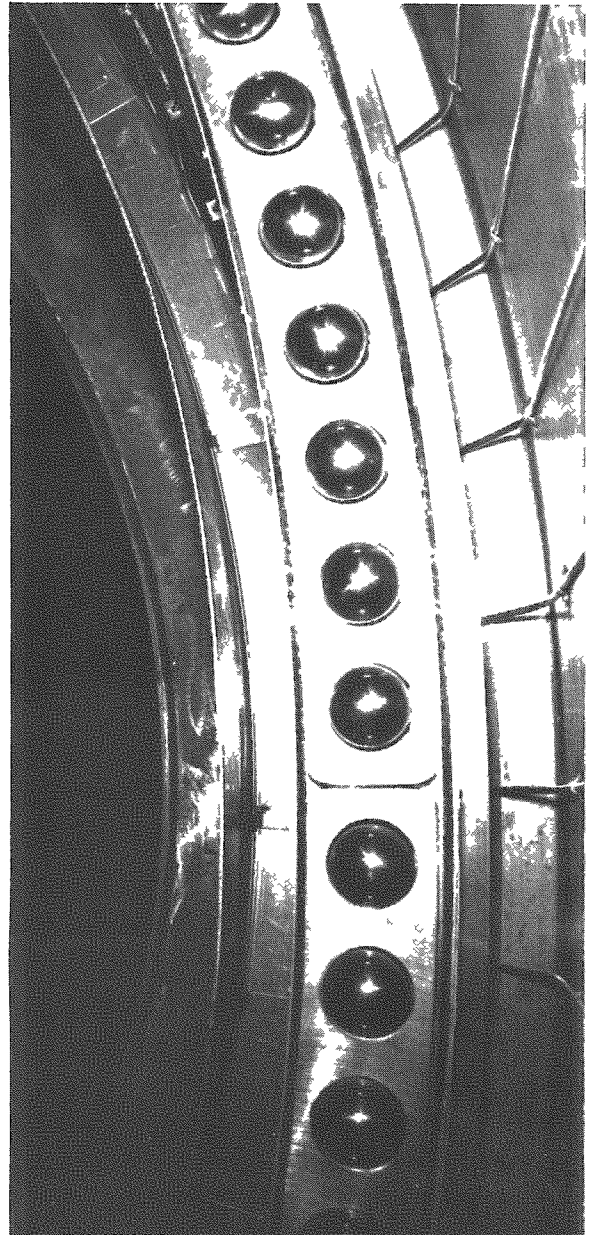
View of Large Rotating Plug Seal Trough before Installation of Plug
